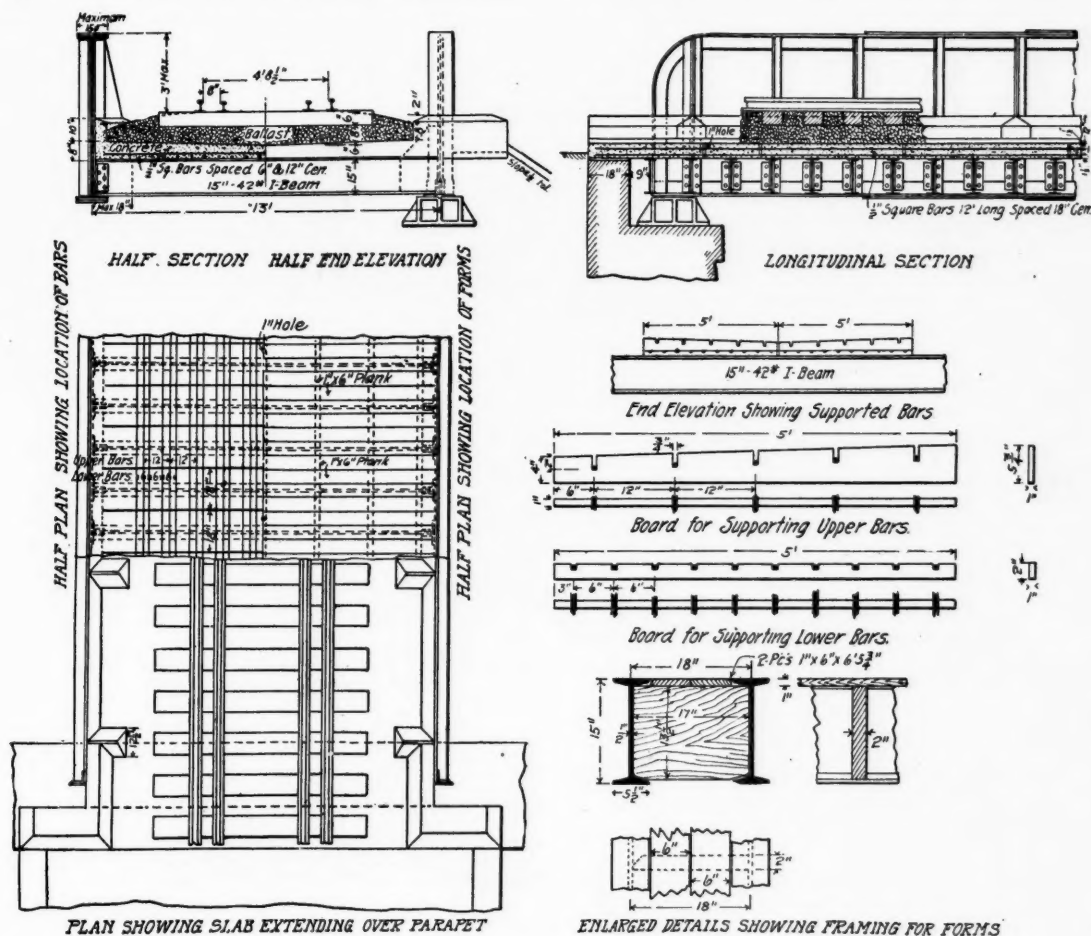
STANDARD REINFORCED CONCRETE FLOOR FOR THROUGH GIRDERS, "DESIGN A," WABASH R. R.
